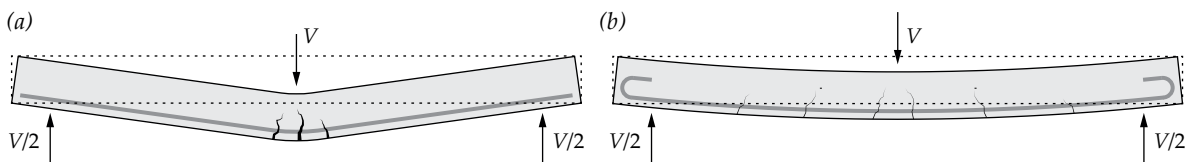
Influence of the detailing of plain flexural reinforcement on the crack pattern and deflections (for a similar load level, adapted from [CEB98]): (a) no end anchorage, localization of the deformation in the loading zone; and (b) hooks, redistribution of the deformation
